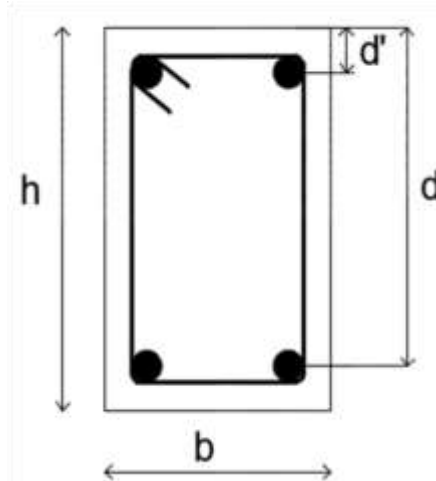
Example of transversal beam section with longitudinal reinforcements
